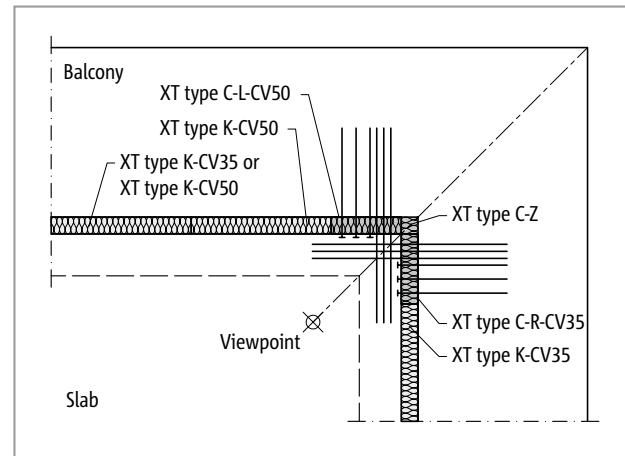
Schöck Isokorb® XT type C: Balcony with outer corner freely cantilevered (application XT type C-L-CV50, XT type C-R-CV35)
